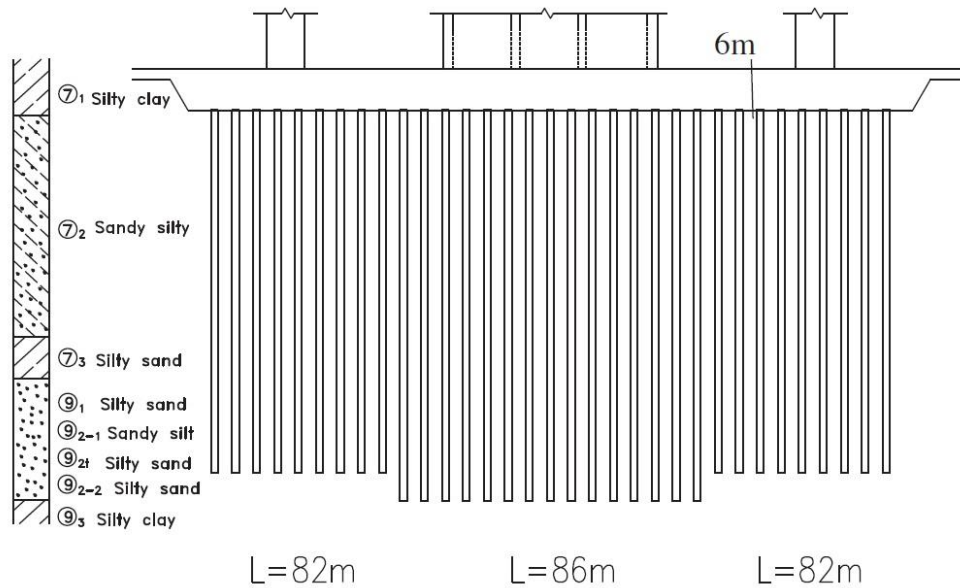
Arrangement of piles of Shanghai Tower – section (Tang, et al., 2014)
